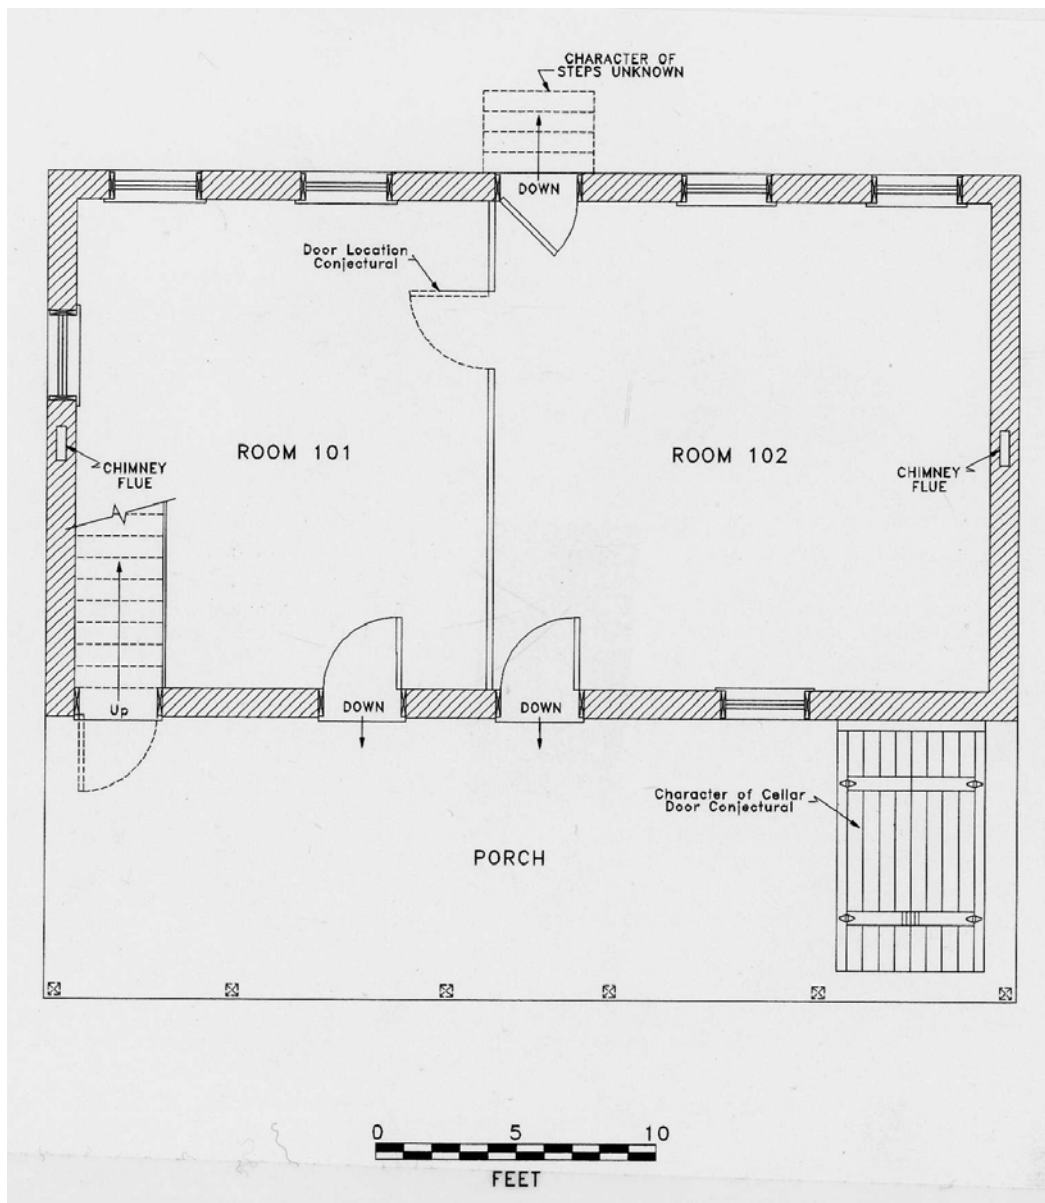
First floor plan of the Valentine House, showing alteration to partition wall (ca. 1875).
